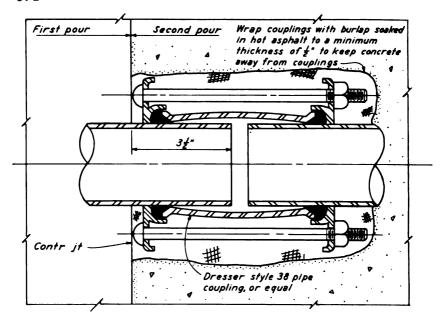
Typical rubber-gasketed contraction joint crossing.
